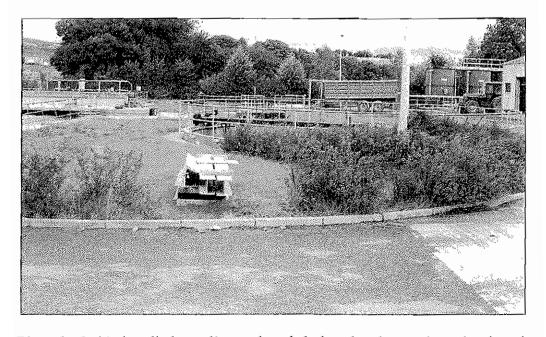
Oxidation ditch, settling tank and sludge chambers to be redeveloped.
